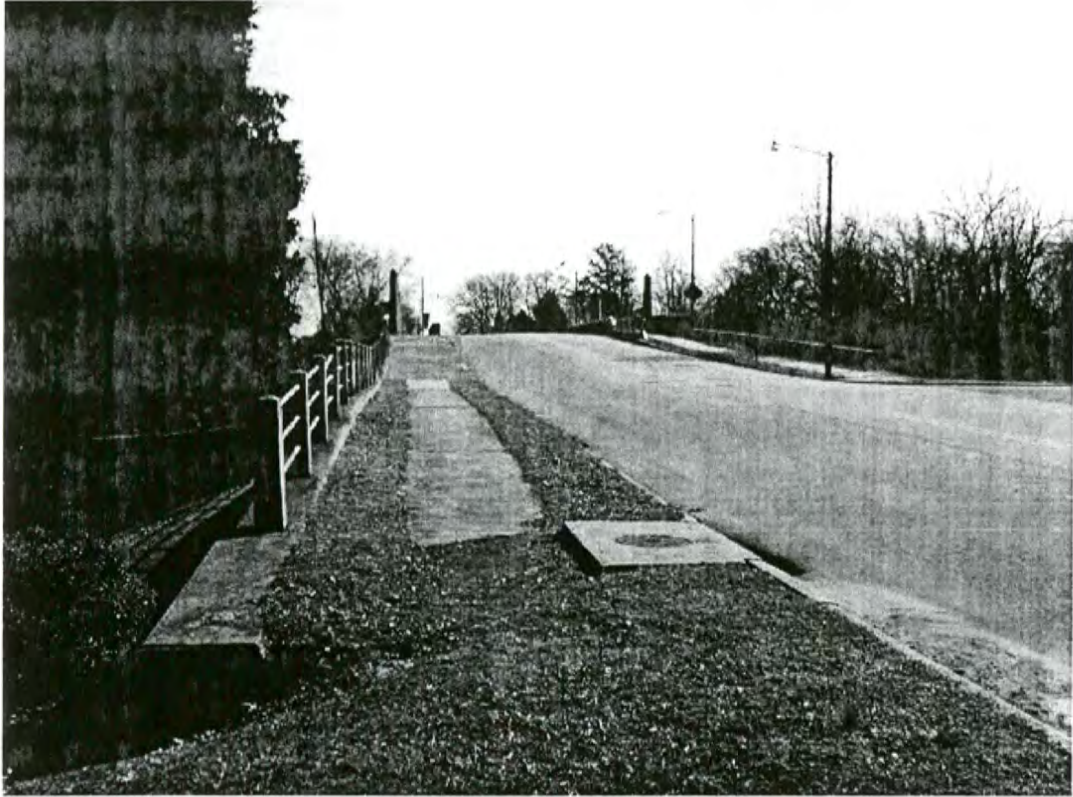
WHITE OAK CEMETERY FENCE AND PIER & 16TH STREET BRIDGE
